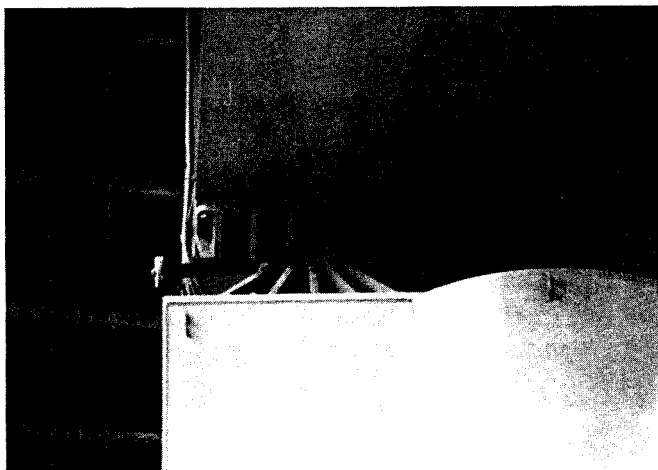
Example of pin bearing damage, by failure of keeper plate.
